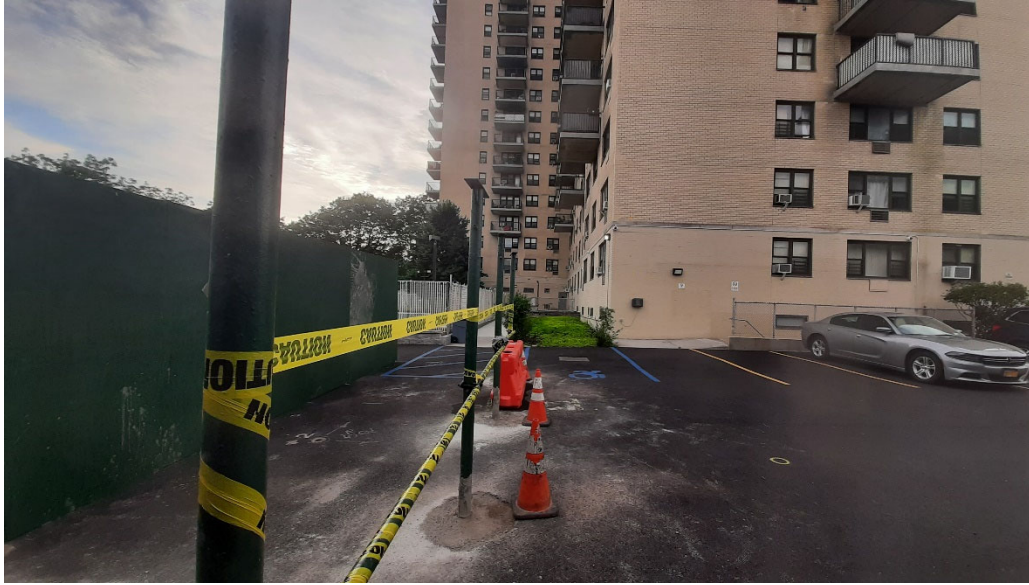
Looking east, exterior view of the construction fencing in the southeast corner of the Site, with new posts in place for the fence expansion.
